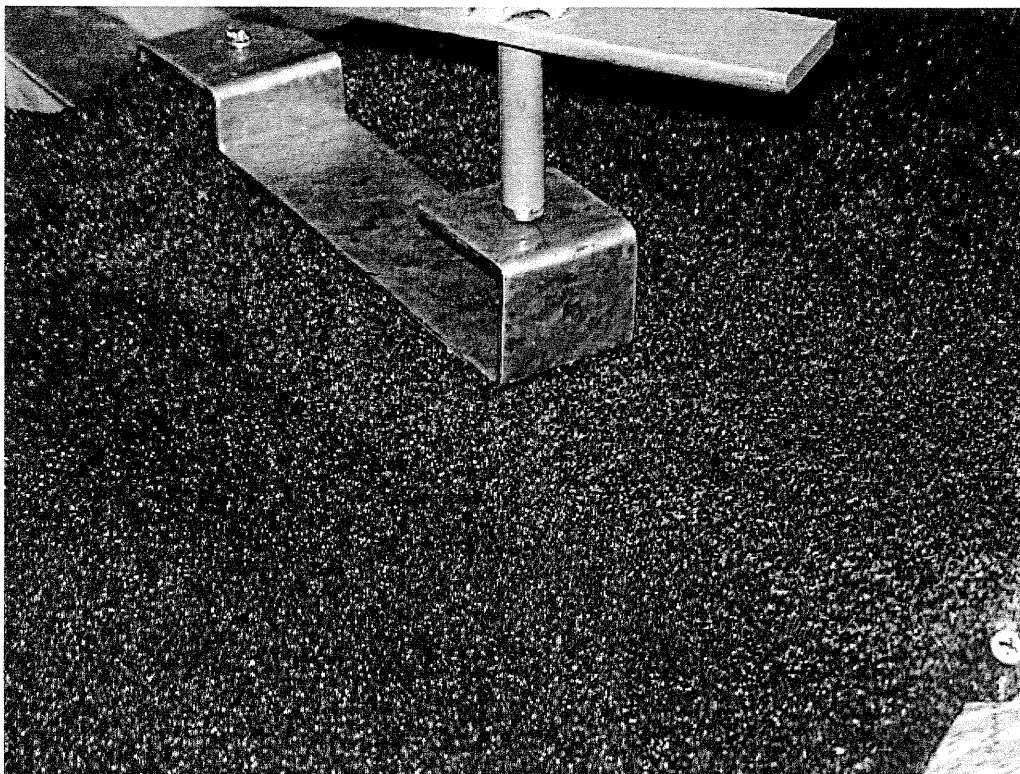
View of the buckling failure of panel beneath the bracket.
